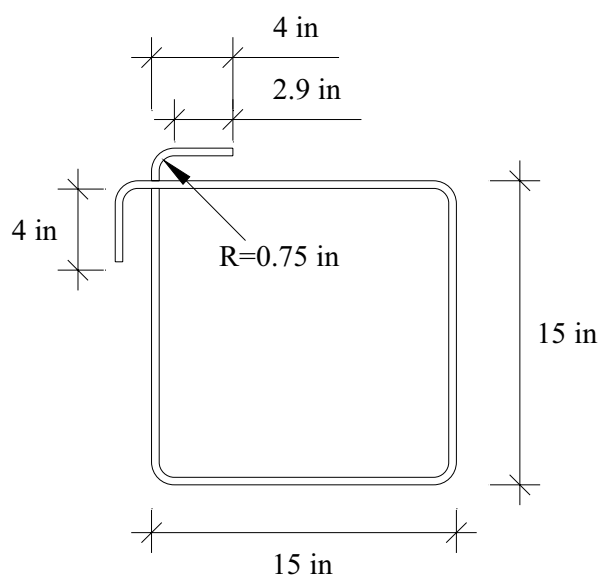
Tie Detail; Specimens C1, C2 & C3
